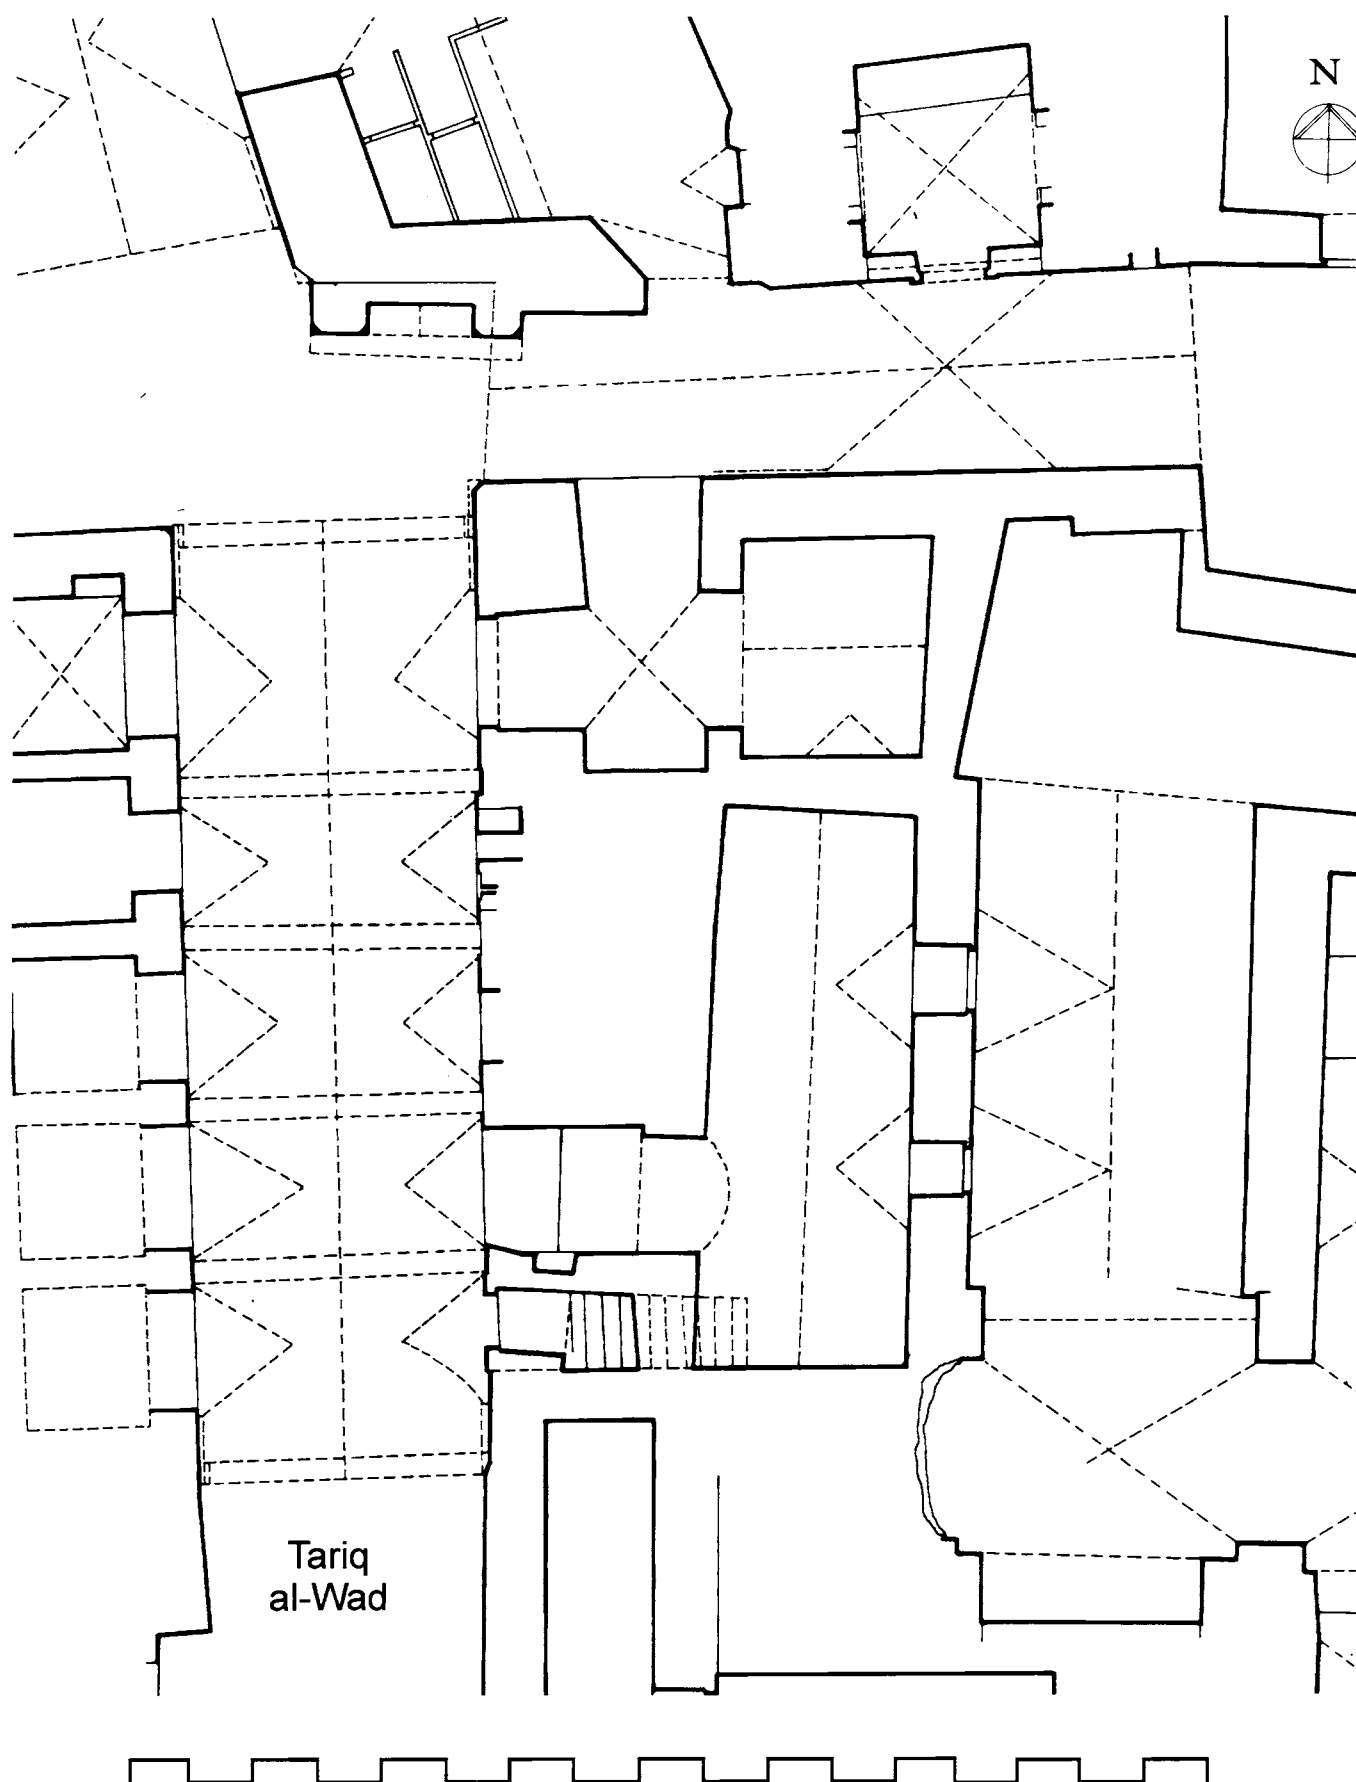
Dar Bairam Jawish, plan of ground floor.
